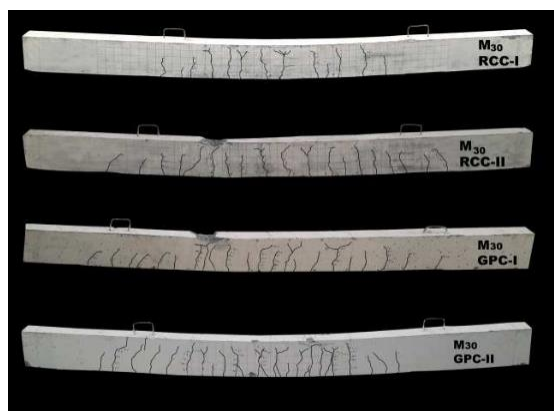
RCC and GPC Beam Crack Pattern [52]
